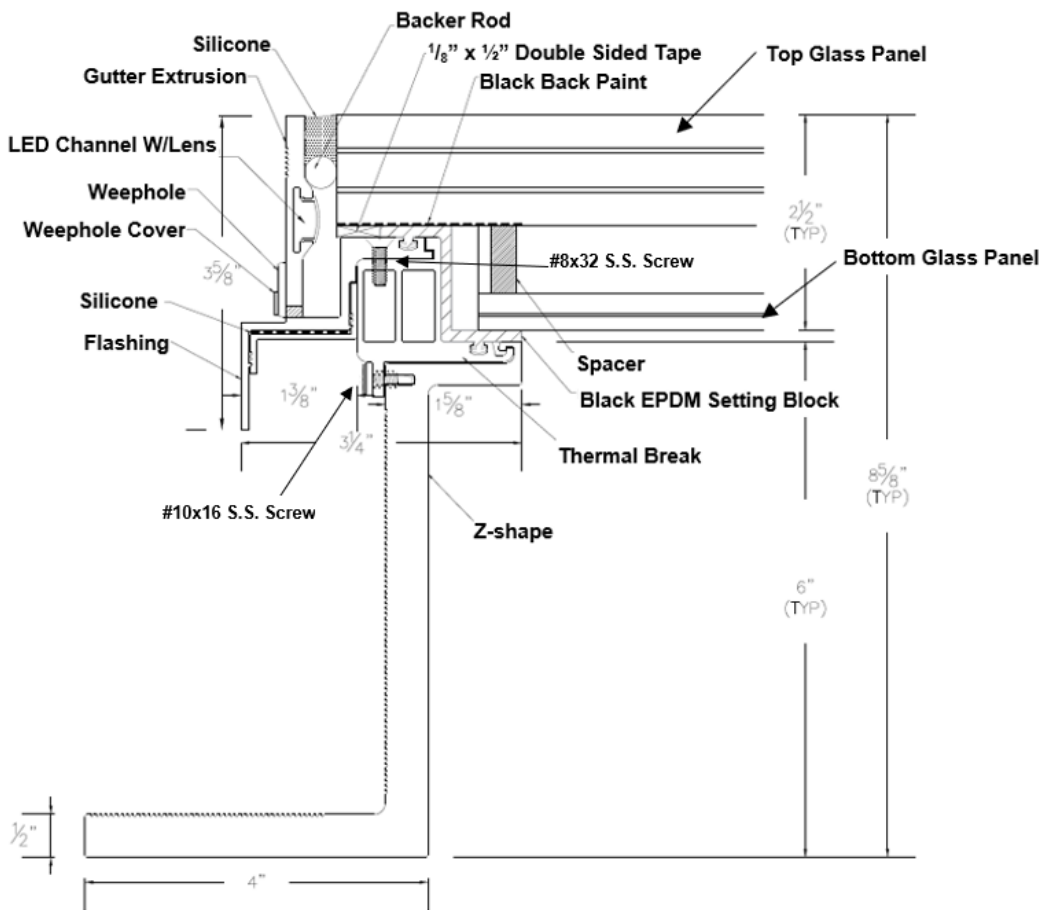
EXAMPLE PERIMETER CROSS SECTION
